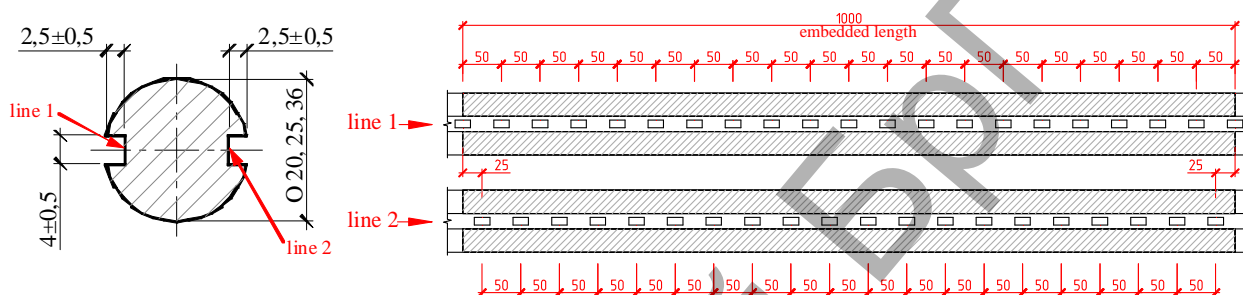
Layout of strain-gages on the reinforcement bar
